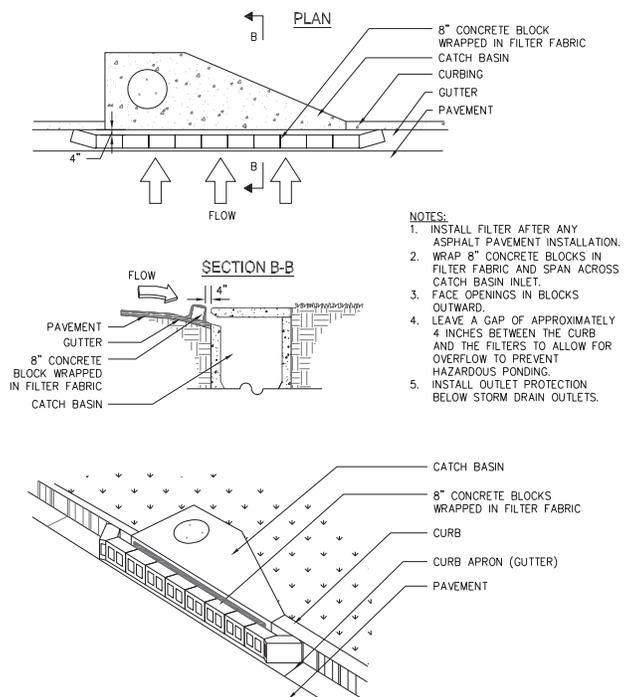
Curb Inlet Protection Installation Requirements (Sd2-P)
